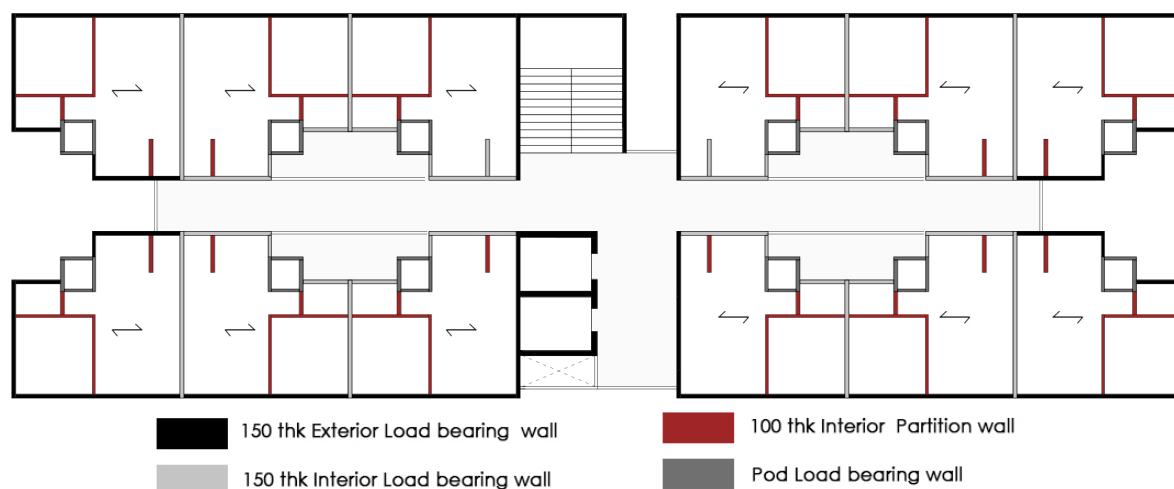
Locations of load-bearing prefab panels on a typical floor plan
